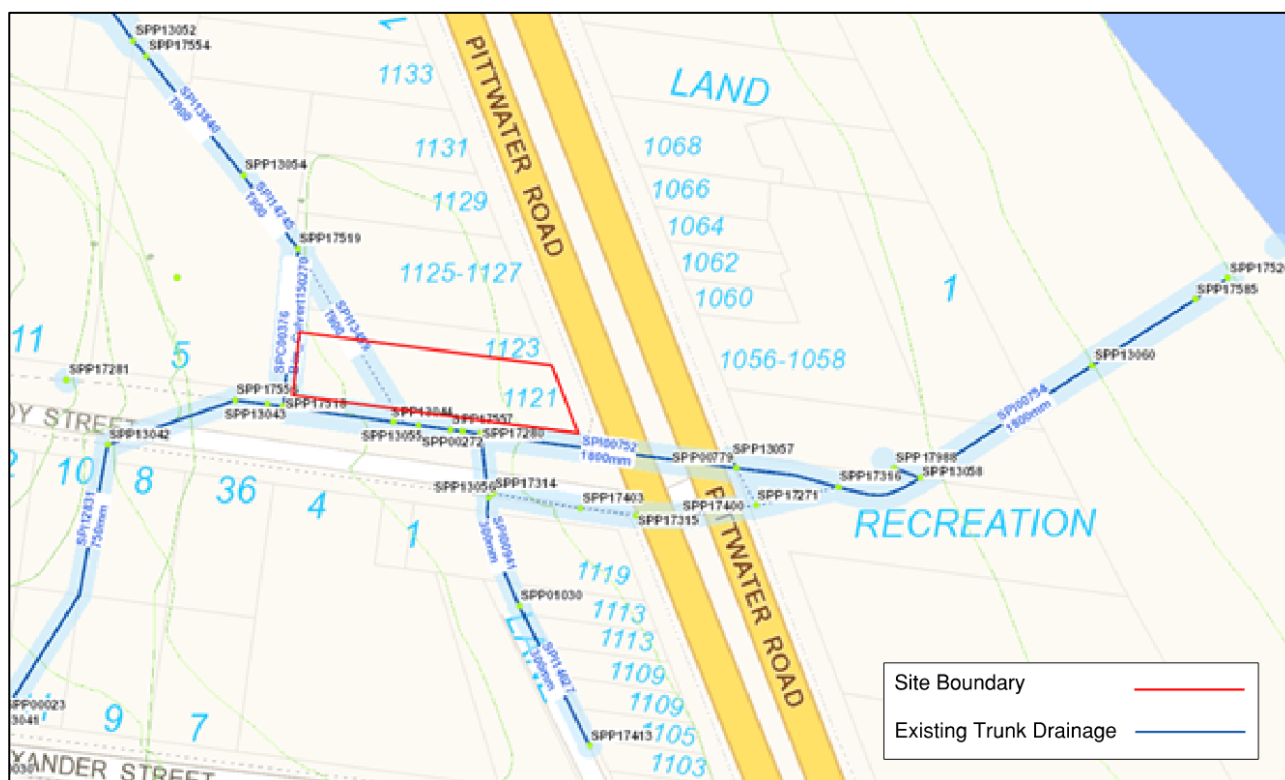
Location of Existing Trunk Drainage Line at Site Proximity
